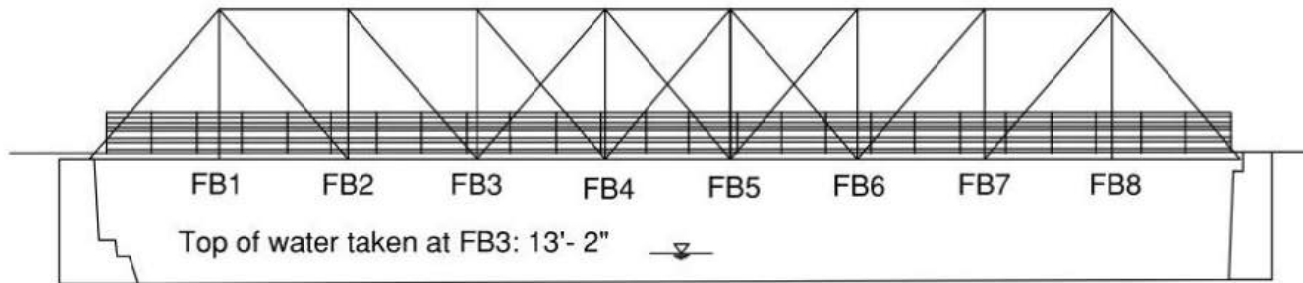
Elevation. Fracture Critical Members Noted in Blue.
